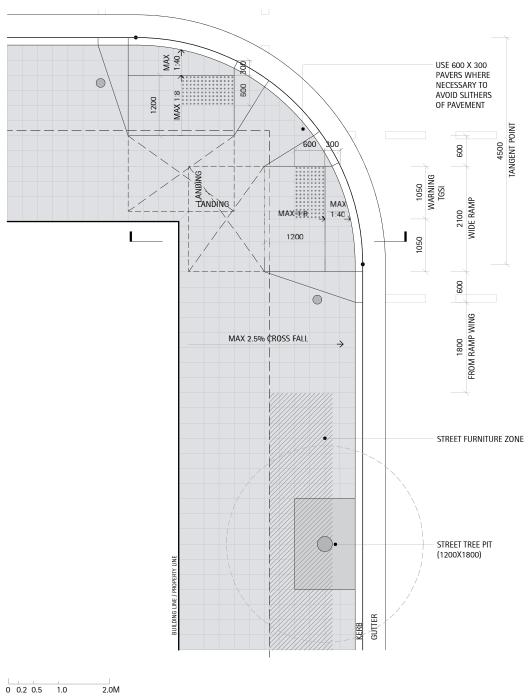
Streets Corner Plan: 4500 Radius 2100 Ramp
